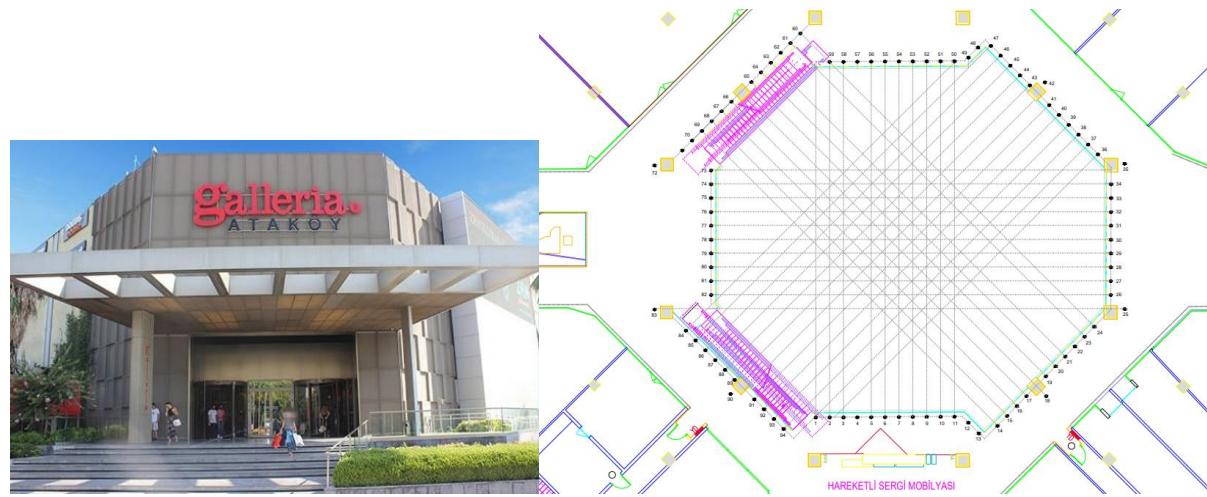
Galleria Shopping Mall Front Facade View and Ground Floor Common Circulation Area Measurement Points
